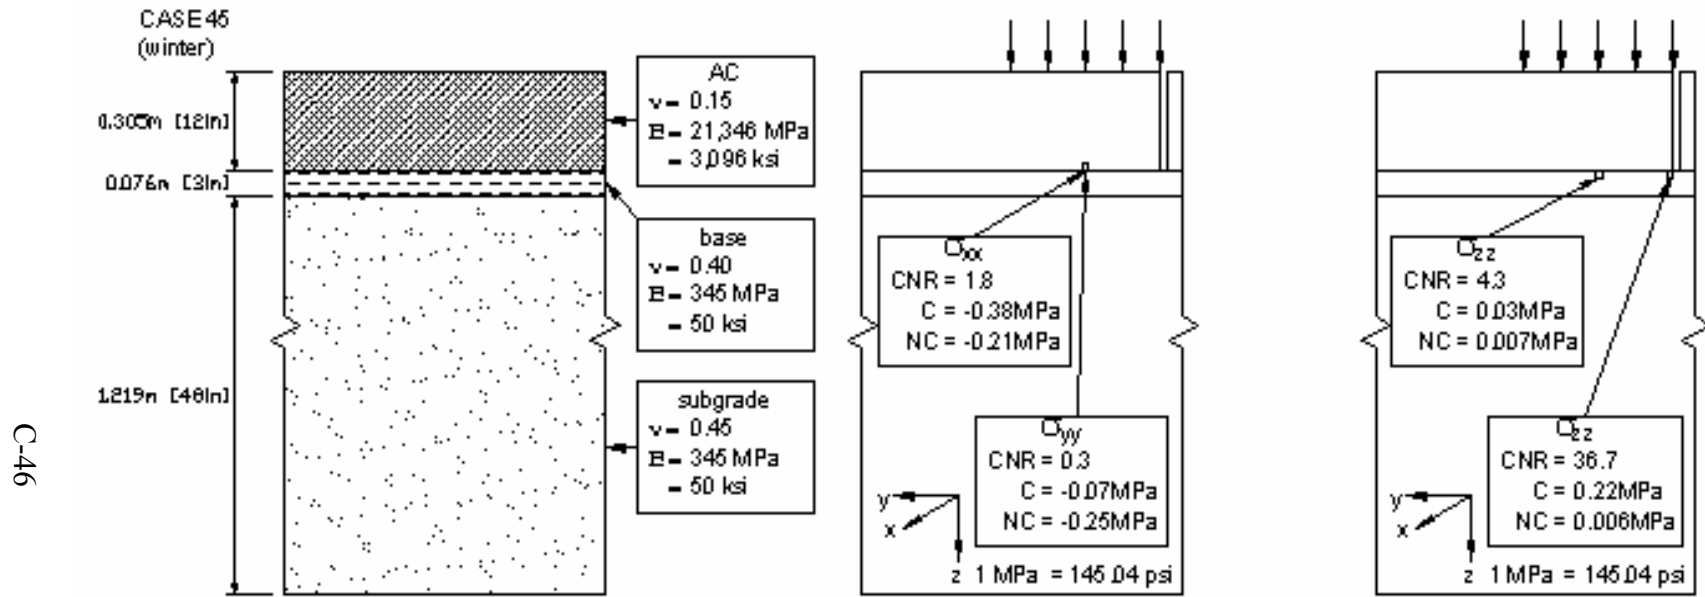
Summary cross section for case 45, (C – stress in cracked pavement, NC – stress in pavement with no crack, CNR – crack/no crack (stress) ratio)
